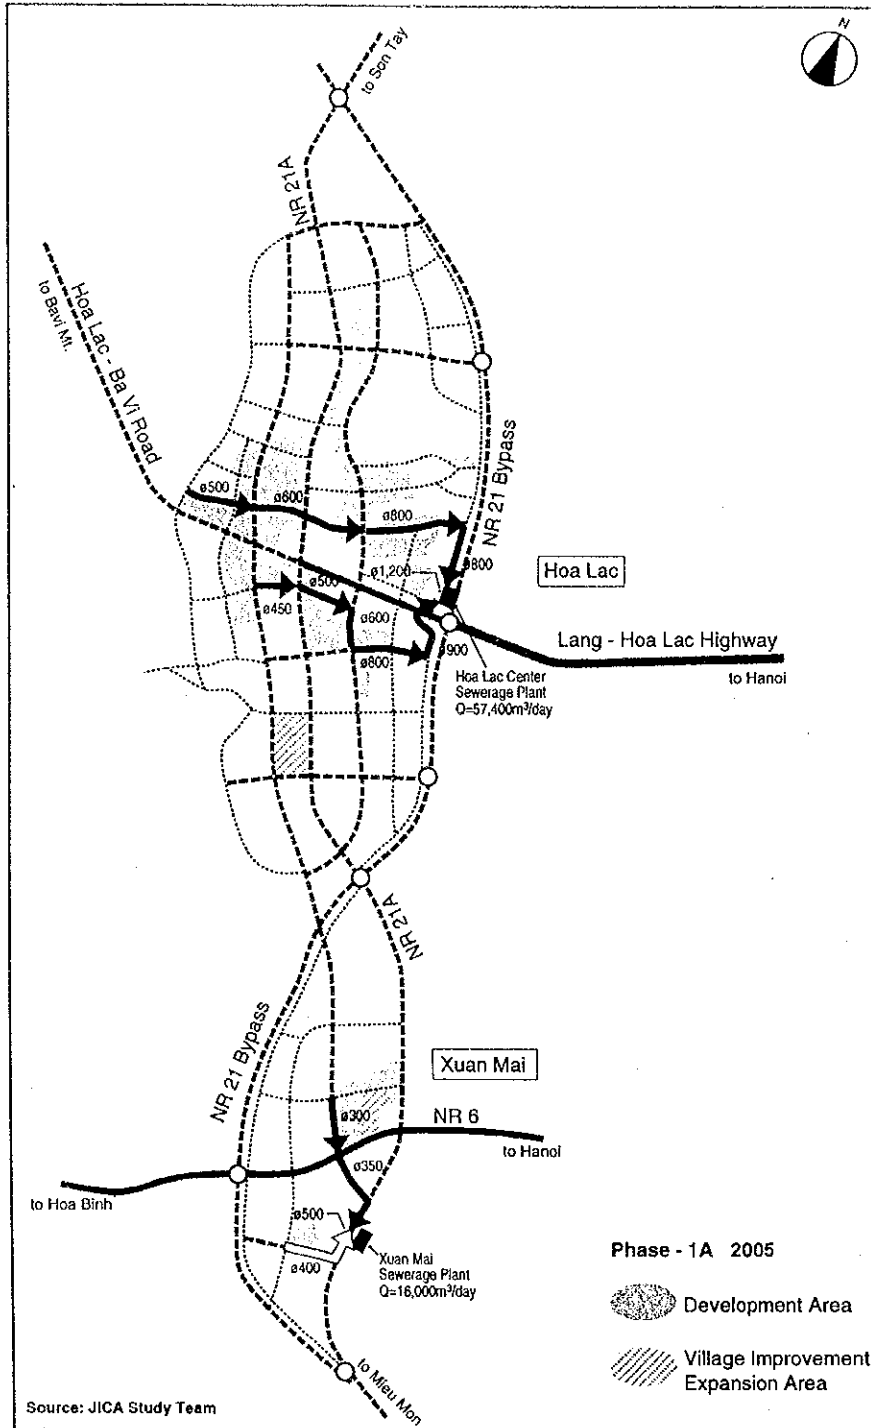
Sewerage Disposal Plan: Phase-1A
